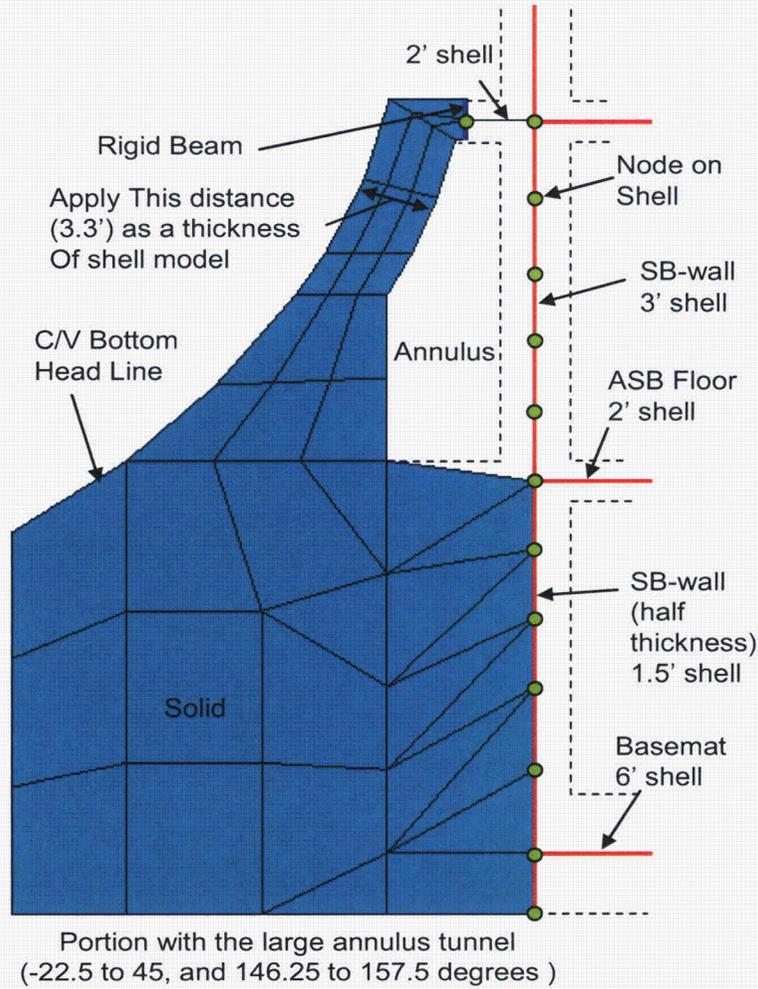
(c) Typical Connection of Auxiliary Building to Dish
